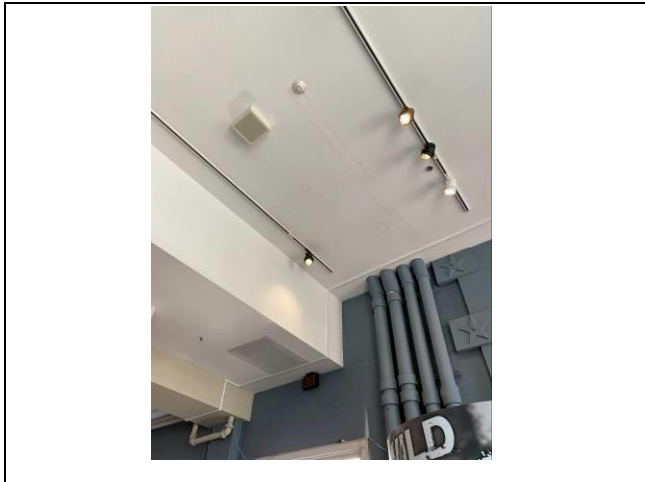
Water Damage Observed on the First Floor Ceiling
